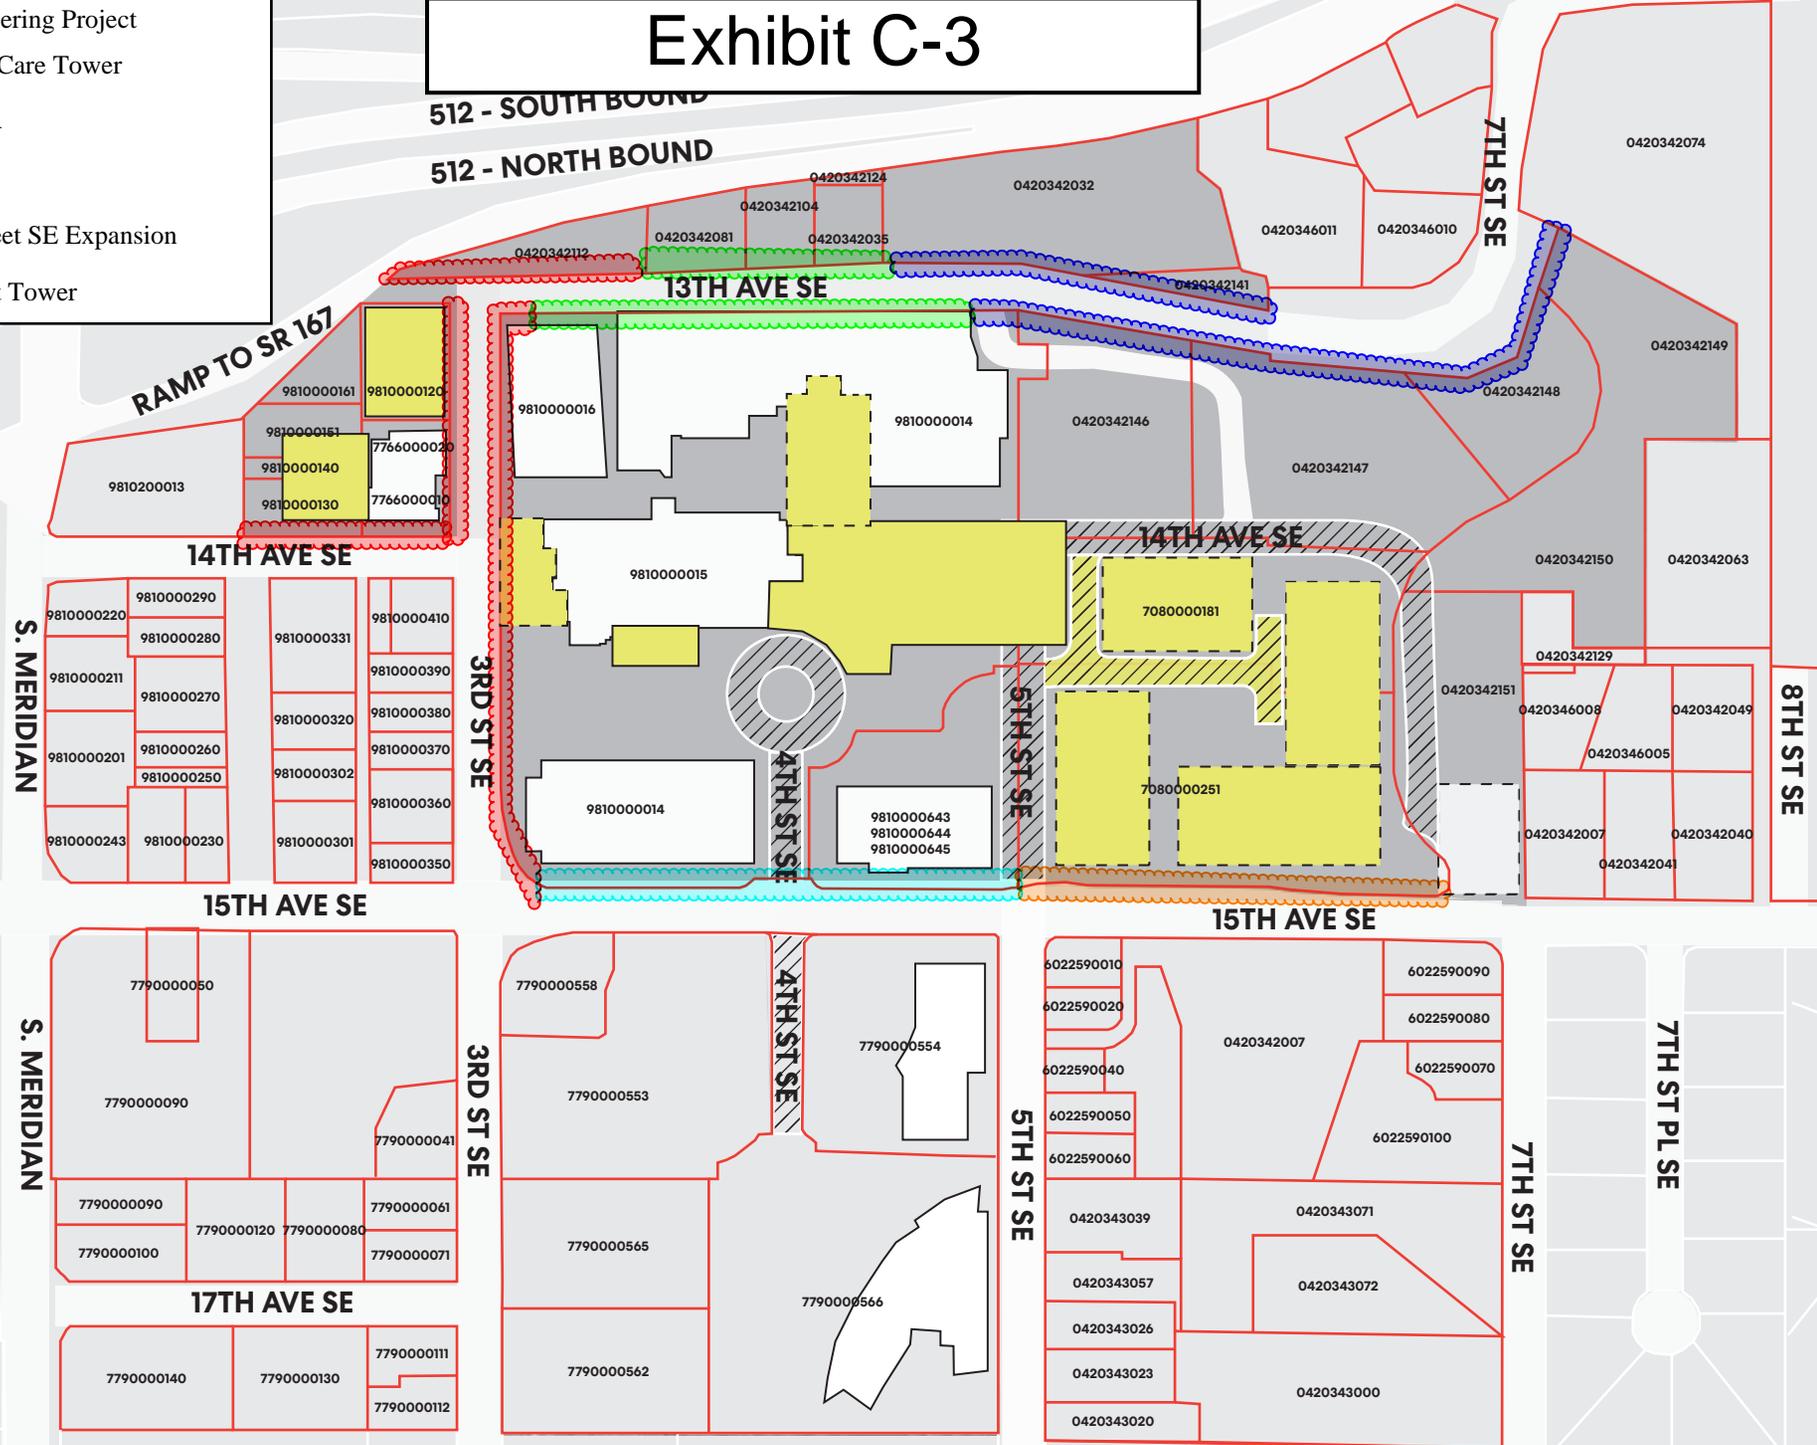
PLAN SHEET TO FRONTAGE PHASING PLAN
